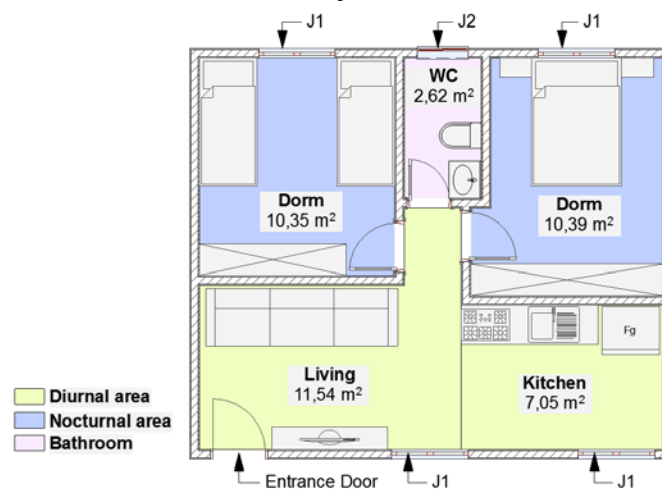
Floor plan of one apartment of Parque Piazza Navona.
